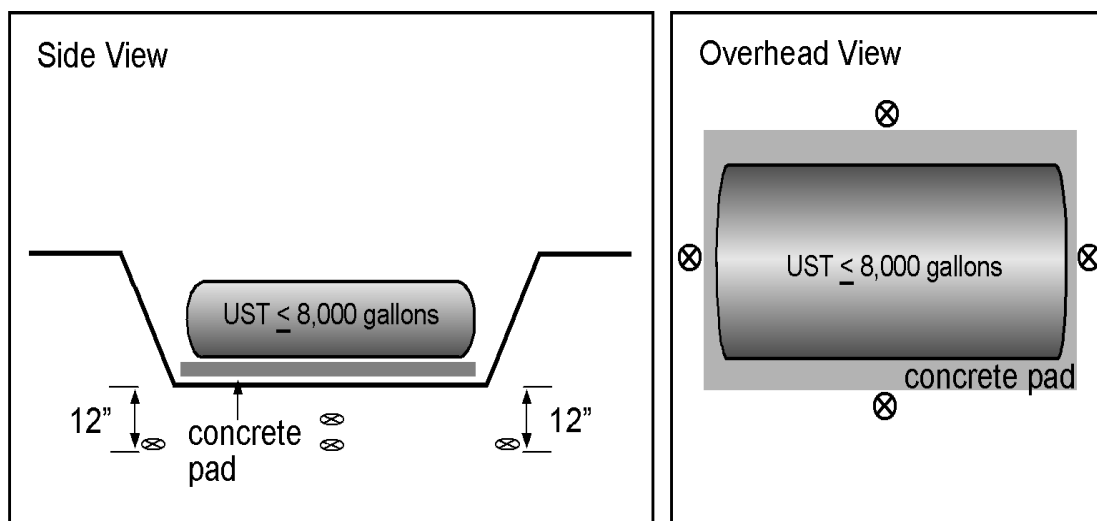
(a). Tank Excavation Sampling for a Single Tank 8,000 Gallons or Less Resting on a Concrete Pad
